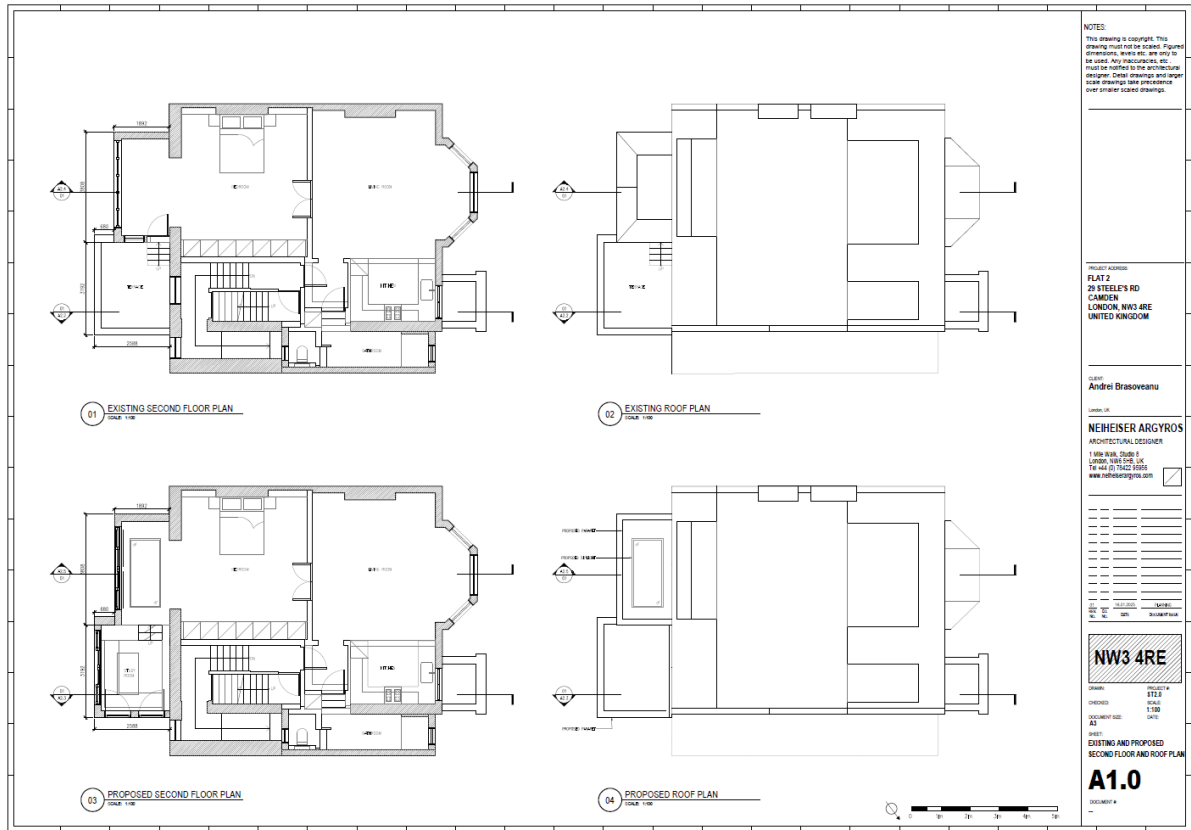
Existing and proposed floor plans (Source: submitted documents)
